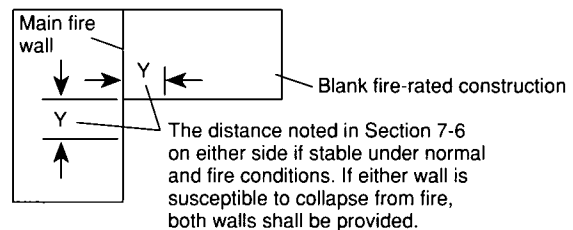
(a) End wall exposure protection — end walls tied to structural framing.
